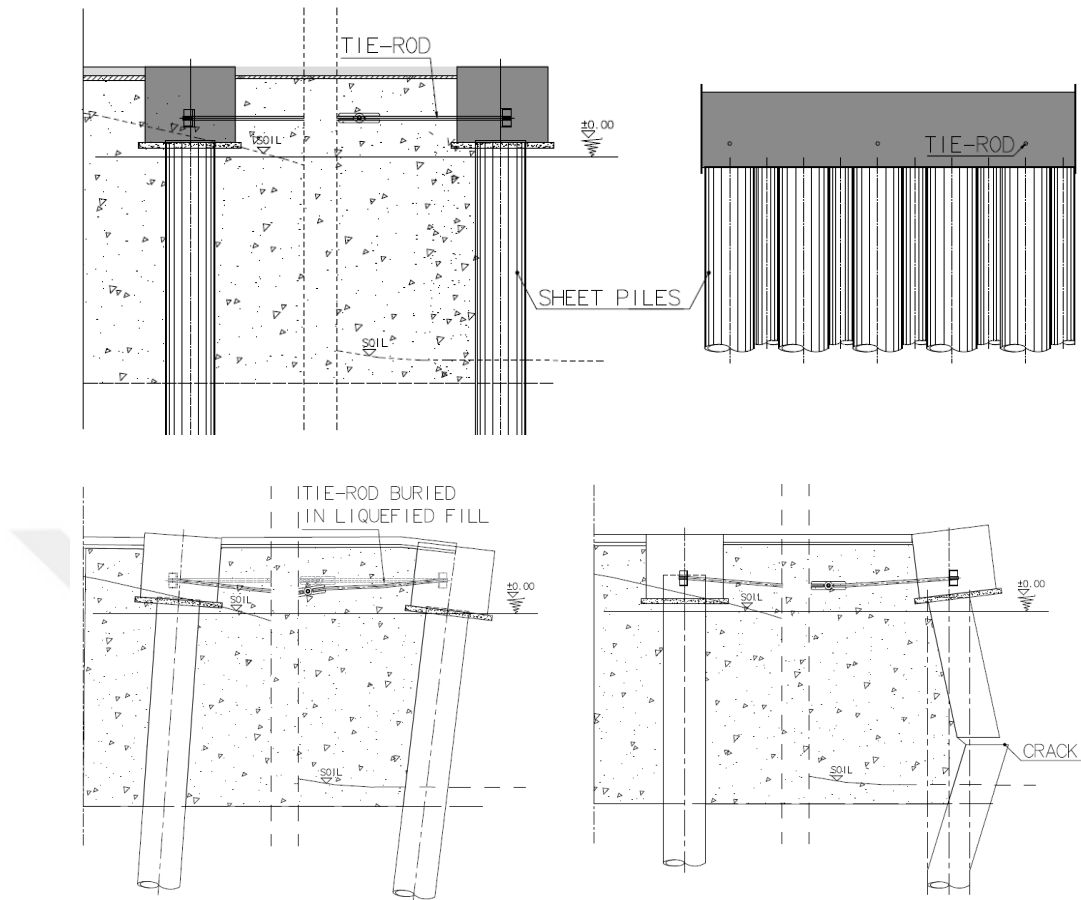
Sheet pile quay wall, (a) Typical cross-sections, (b) Damage representative drawings
